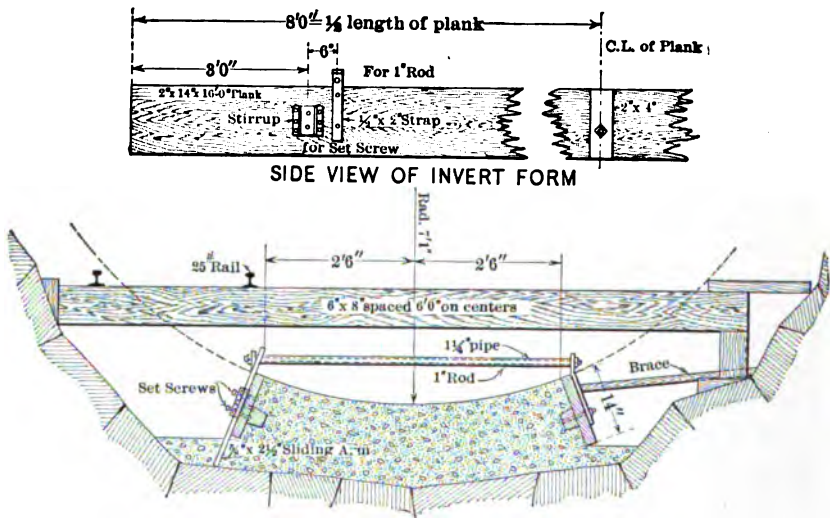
Details of Continuous Invert Form for Pressure Tunnels. Also "high line" for placing concrete directly from cars.
